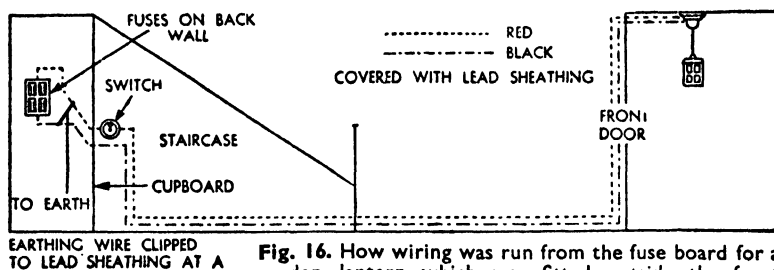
How wiring was run from the fuse board for a garden lantern which was fitted outside the front door. The cable is conveniently earthed as shown.
